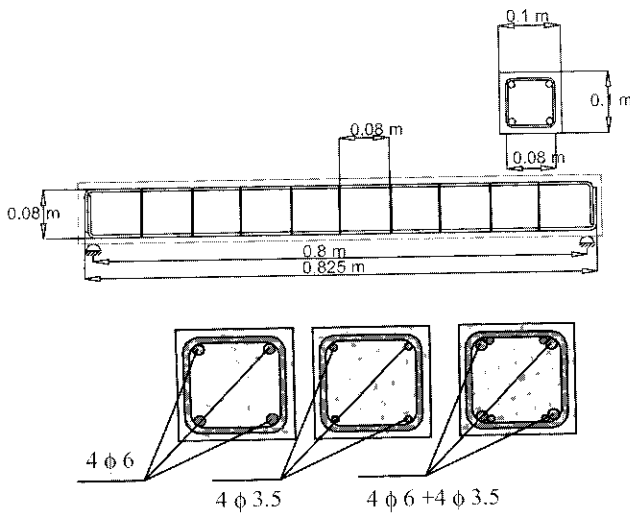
Beam geometry and detail for the reinforcement bar configurations.
